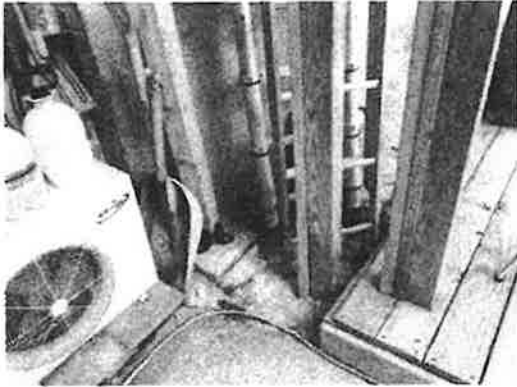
Additional posts added post base anchorage added. Additional 2x's added to existing posts. Screw 2x's better to posts with 2-7/8" head lock screws at 16" on center.
